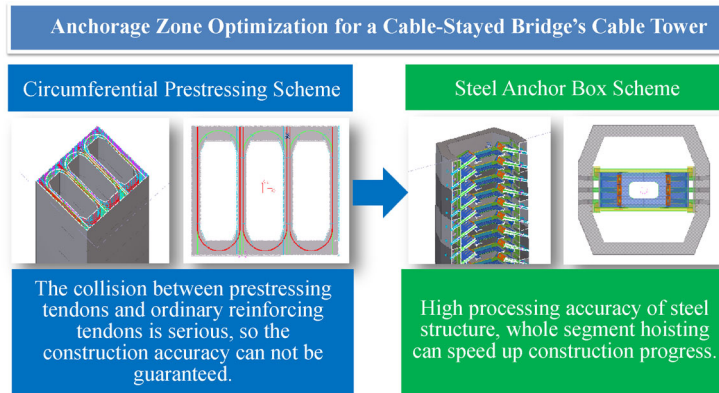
Optimum design with BIM in a cable-stayed bridge.
